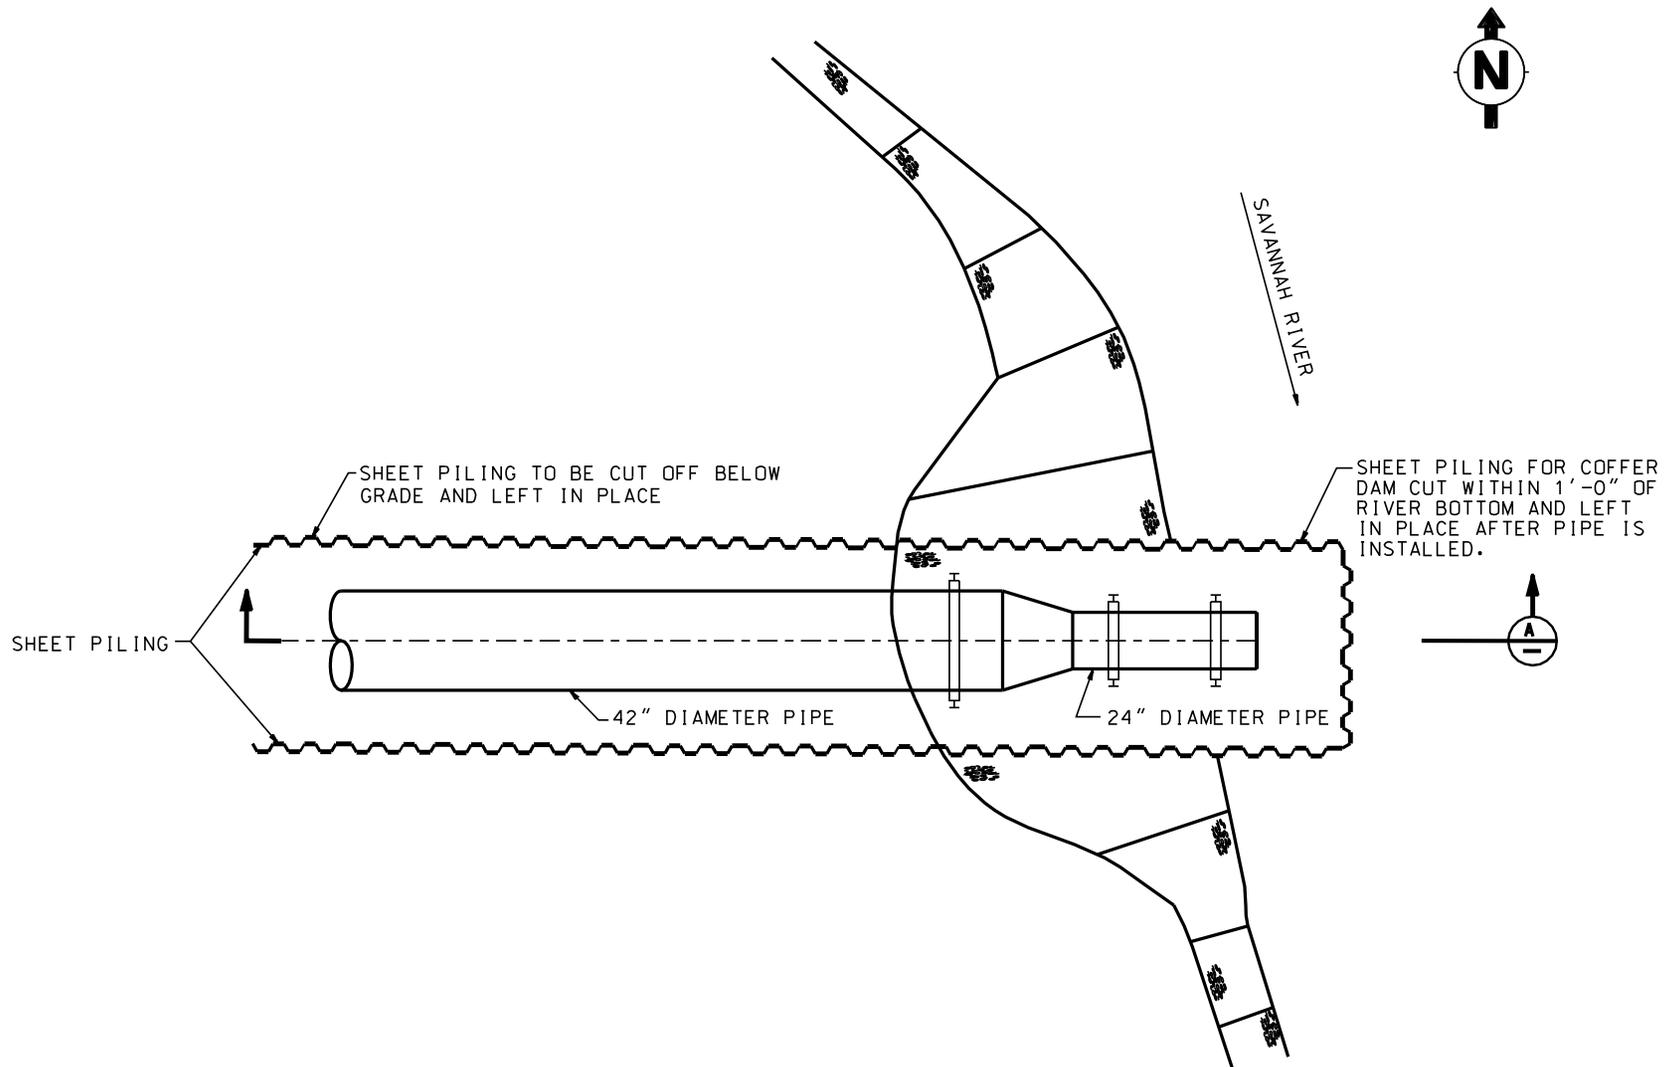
Plan View of New Discharge Outfall for the Discharge System
